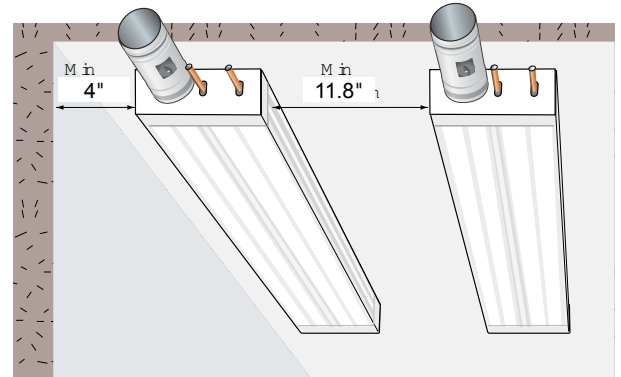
Minimum dimensions when two Podium beams are installed close to one another or near a wall.
